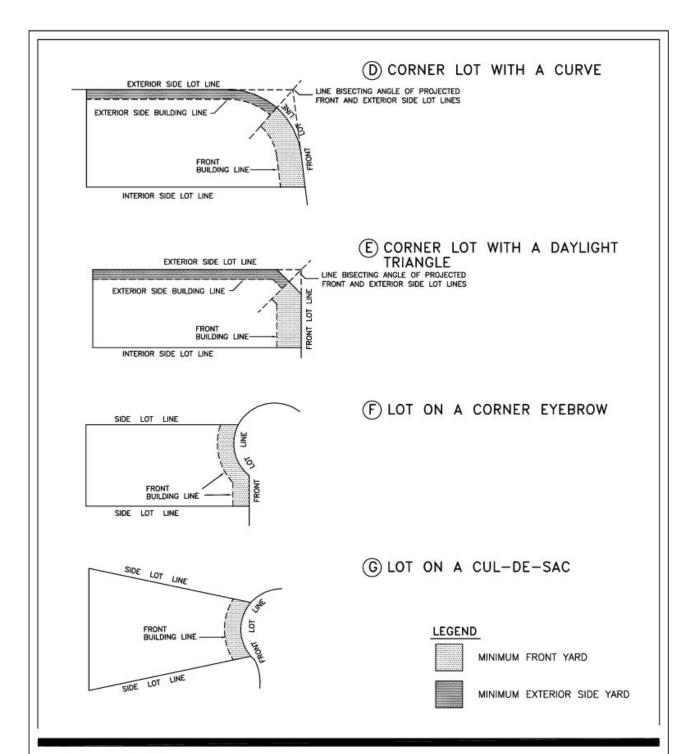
Illustration of MINIMUM FRONT YARD and MINIMUM EXTERIOR SIDE YARD City of Brantford Zoning By-Law
